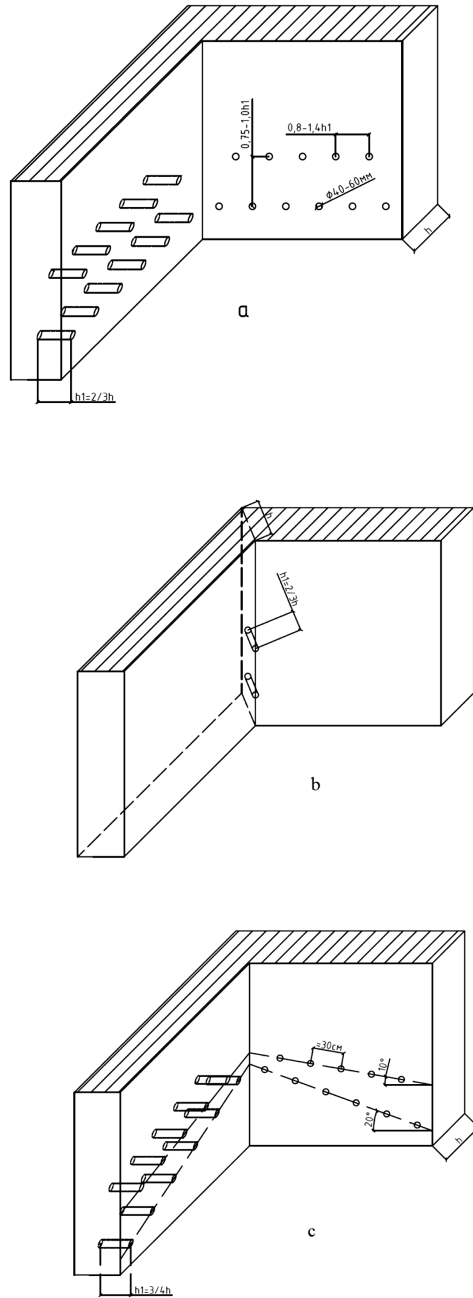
Blastholes layout at buildings demolition to footing within a wall at a corner in case of intended demolition
